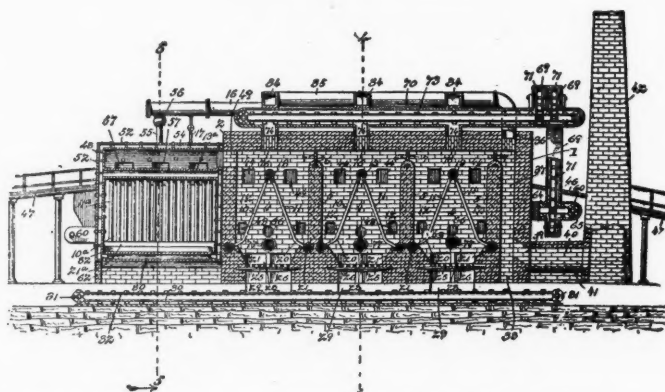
LONGITUDINAL SECTIONAL VIEW OF ENTIRE CREMATORY.
